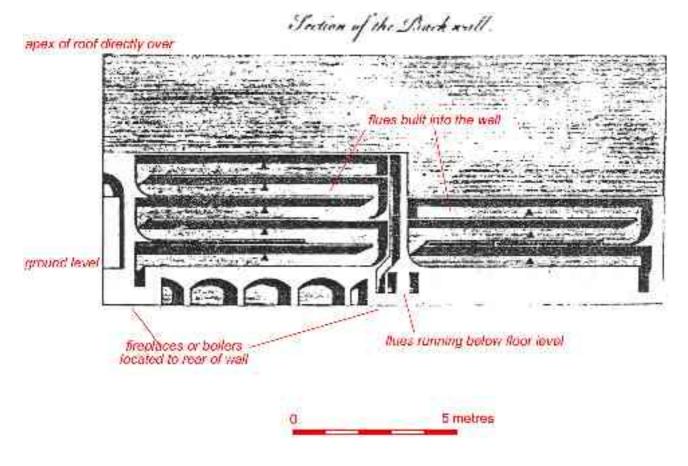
Longitudinal section through the back wall of a heated glasshouse constructed at Kew *c* 1761, with annotations added in red *(Chambers 1763)
